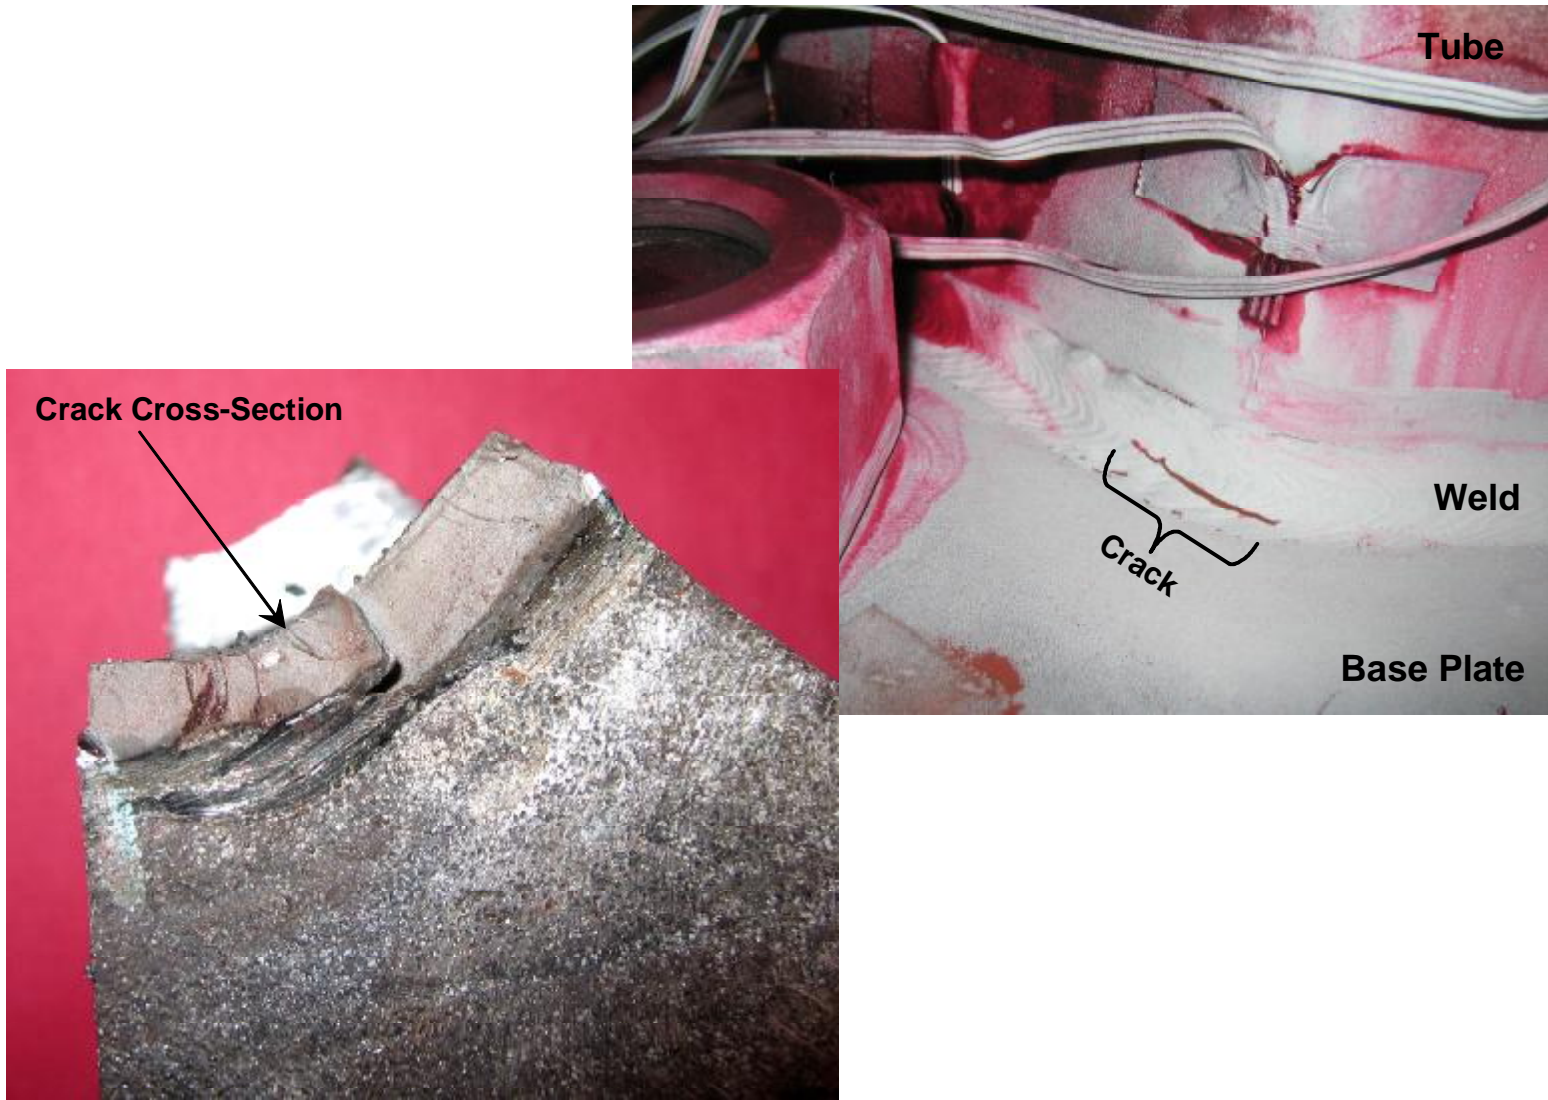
Weld root cracks in pole socket connections.
